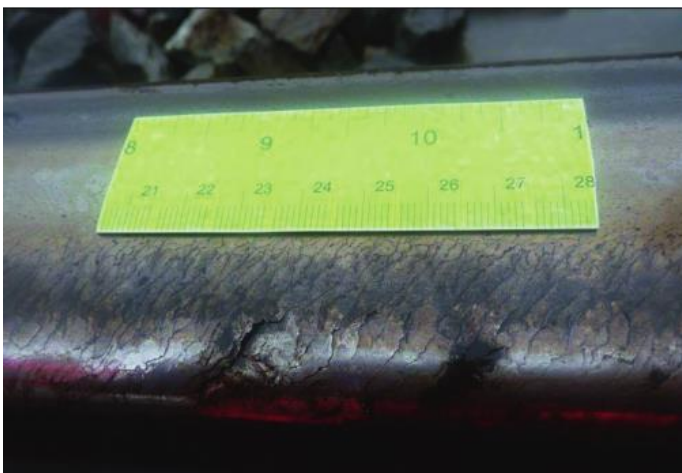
/1b: Repair, don't throw away: Head checks ("oblique") and deep wheel slip marks, which normally require a closure rail replacement, can be repaired or built up and optimised with automated GMAW welding
